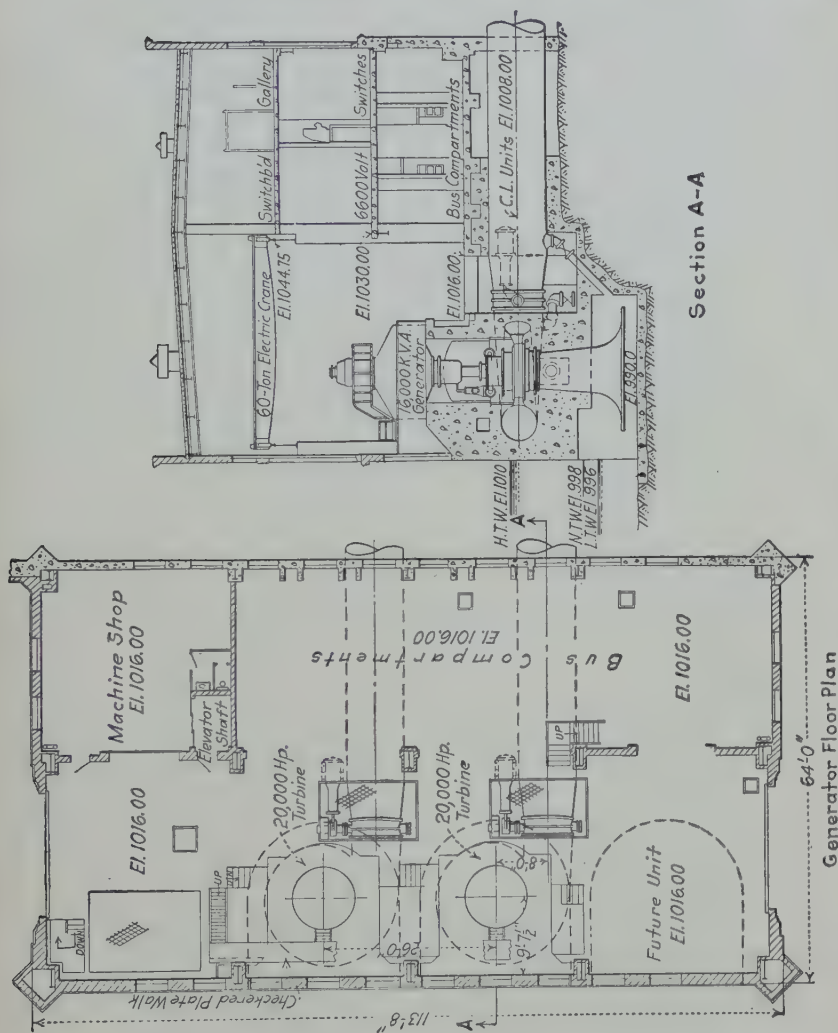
Power house, plan and section, Davis Bridge plant—New England Power Company.
